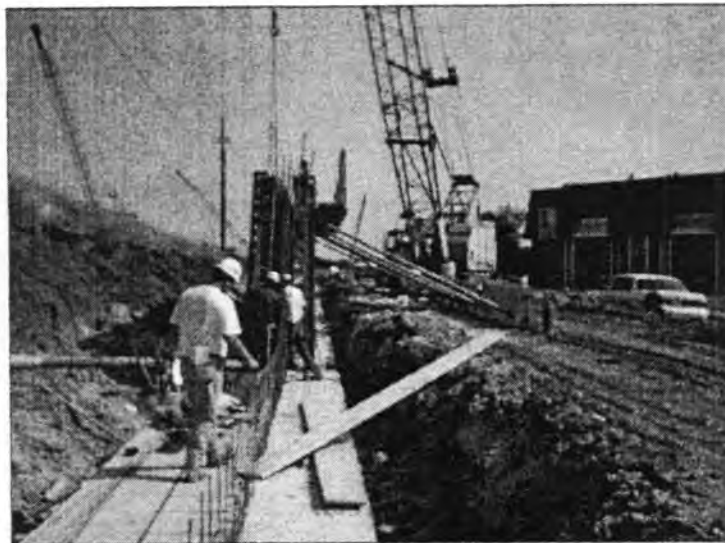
Picture illustrating the setting for form work for cantilever retaining wall
